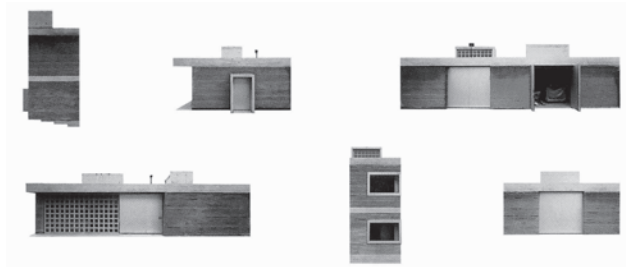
Boltshauser Architekten, Facades of the small buildings at the Sihlhälzli school grounds, 2002. Montage by the architect.
